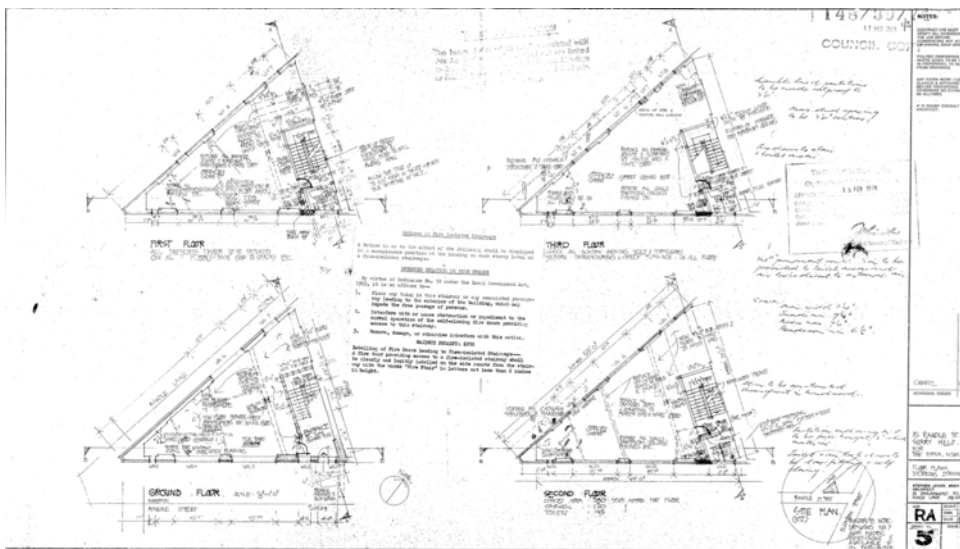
B Floor plans by Stephen Javor. RAIA
